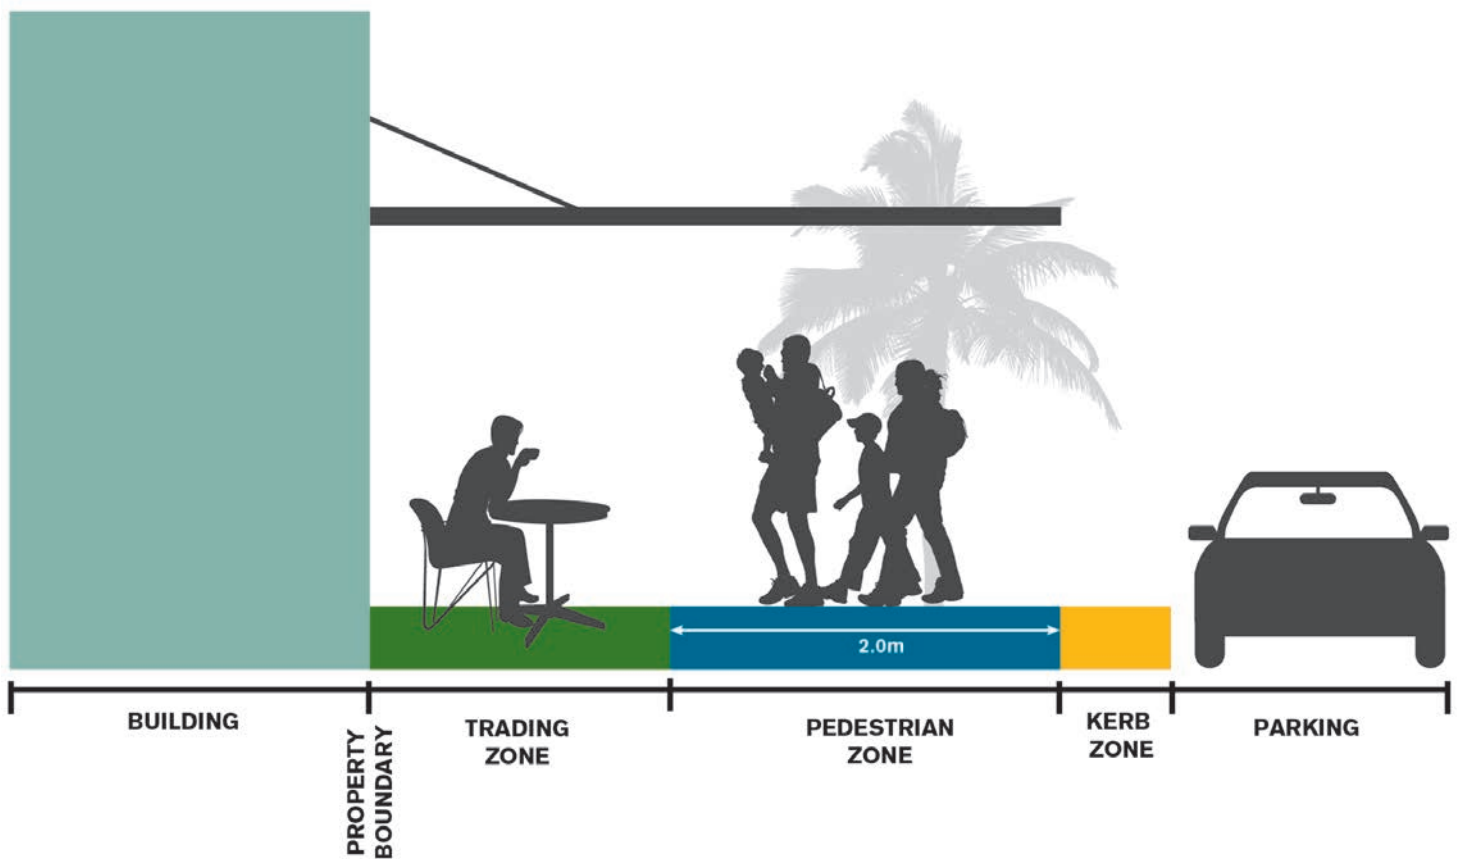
Transect of an alternative footpath zones arrangement within the streetscape
